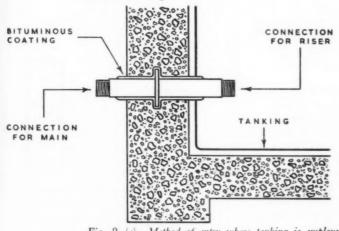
(c). Method of entry where tanking is employed in basement of block of flats. A flange is welded on a short length of pipe which is coated with bituminous material and set in position before concrete is poured.
